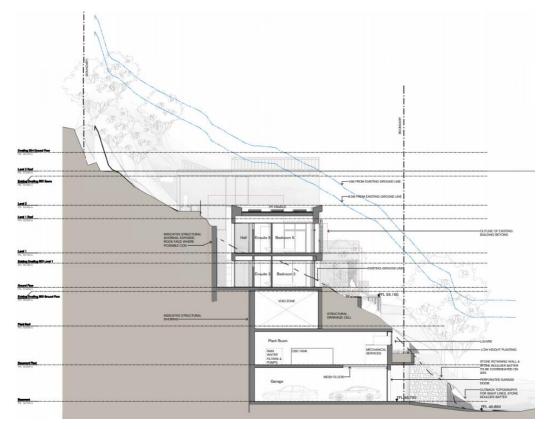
Proposed section 1 looking north, Extract from Sections Sheet 1 (Source: Drawing No. 3000, Rev. A)
